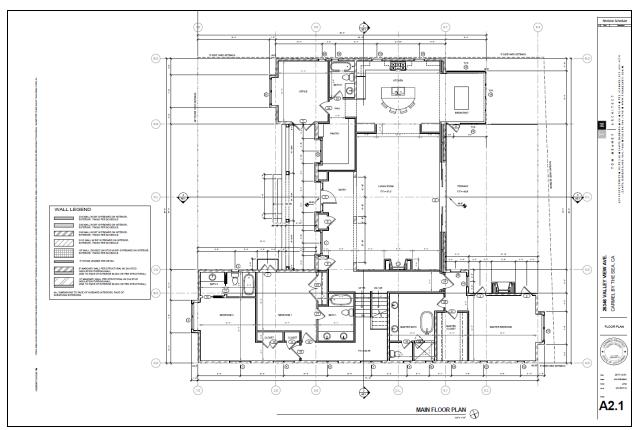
Main Floor Plan: Proposed floor plans for the new two-level single family dwelling at 26346 Valley View Avenue.
